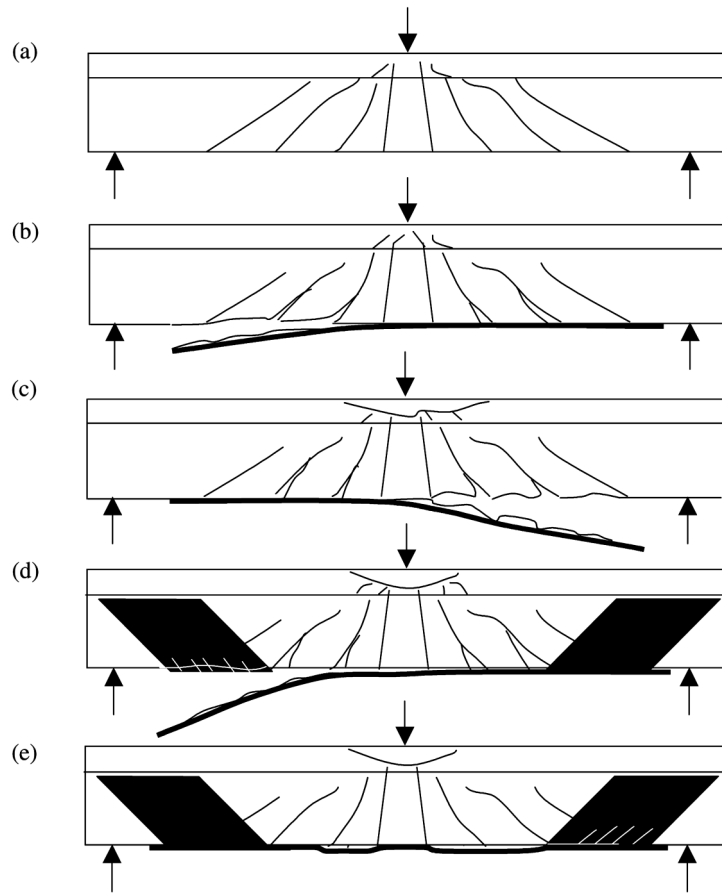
Failure modes of unstrengthened and strengthened RC beams for Group 3 and 4: (a) Flexural failure; (b) Tension-shear failure between concrete surface and the CFRP sheet; (c) Crushing of compressive zone in concrete and then tension-shear failure; (d) Fracture of CFRP along the diagonal edge; (e) Tension-shear failure and partial CFRP rupture along the diagonal edge
